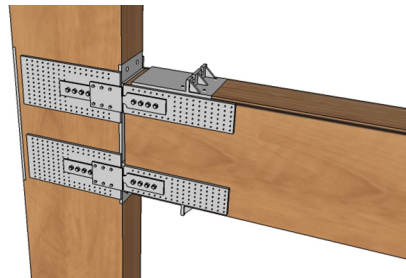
Steel reinforced joint with Necked Plate Dissipaters
